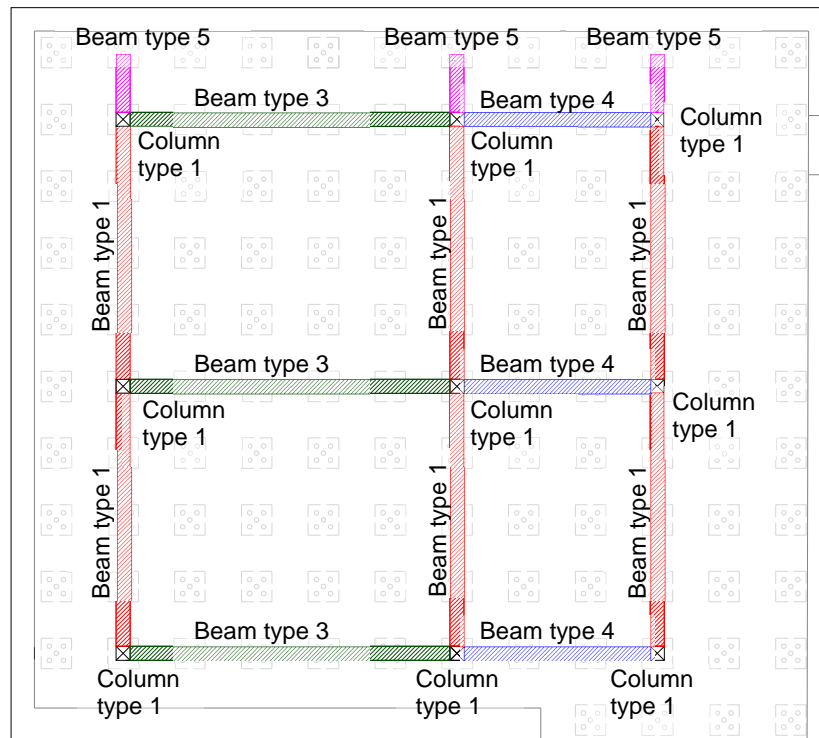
Steel profiles for the asymmetric full-scale specimen
